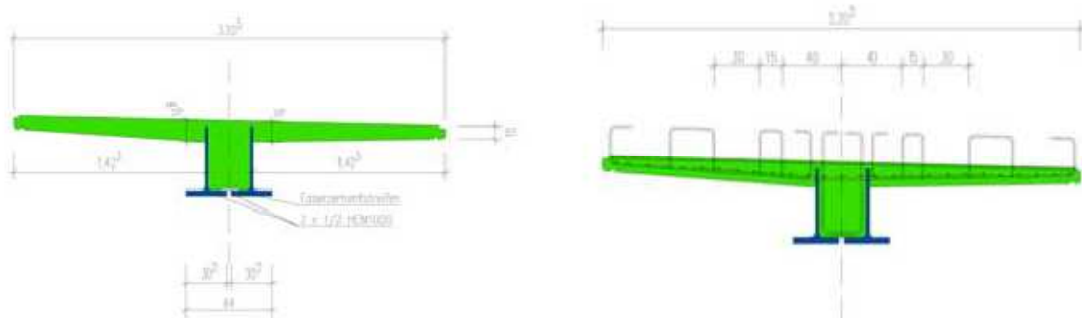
VFT-WIB girder of the bridge in Pöcking.
